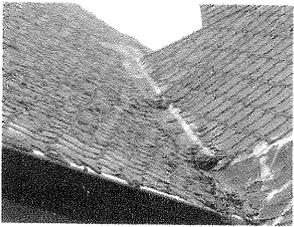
Intersection of main roof and gable on back of church facing Hogans Alley. Damaged and or missing shingles and damaged flashing. Improper repair with rolled roofing.
